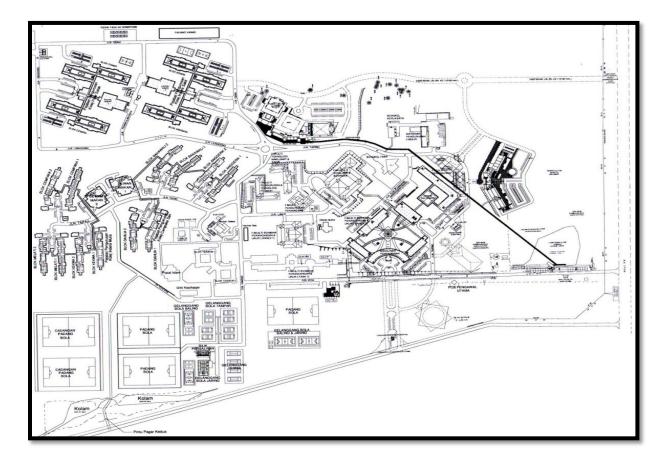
shows a plan that indicates the direction to move around the campus. The plan is showing on which area the classes and faculties are located, as well as offices, dormitories and other buildings inside
